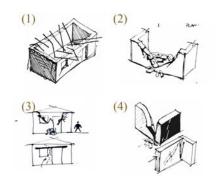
(1) Typically the roof collapses inwards due to reduced wall support and poor connections. The probability of this damage pattern occurring is increased when heavy roofing materials such as earth are used. (2) Wall collapse under face loads is a common earthquake damage pattern with adobe. This is especially true for long walls without midspan buttresses. (3) Timber lintels above windows and doors typically fall due to insufficient wall support. When openings are too close together wall strength is compromised which increases the structures vulnerability to collapse by shear cracking. (4) Earthquake damage commonly occurs when building elements are not connected together adequately. Walls can separate at the corners due to poor bonding of the block courses in this area.
